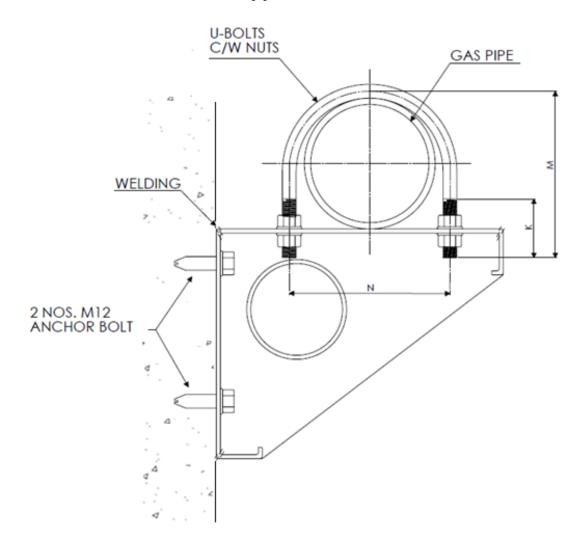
Typical Pipe Support for Horizontal Gas Pipe (G)
